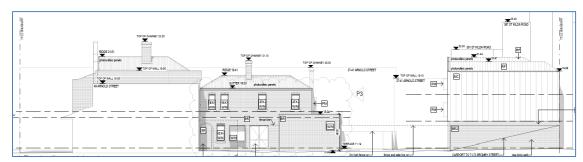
Extract of proposed north elevation plan (Source: applicant)
